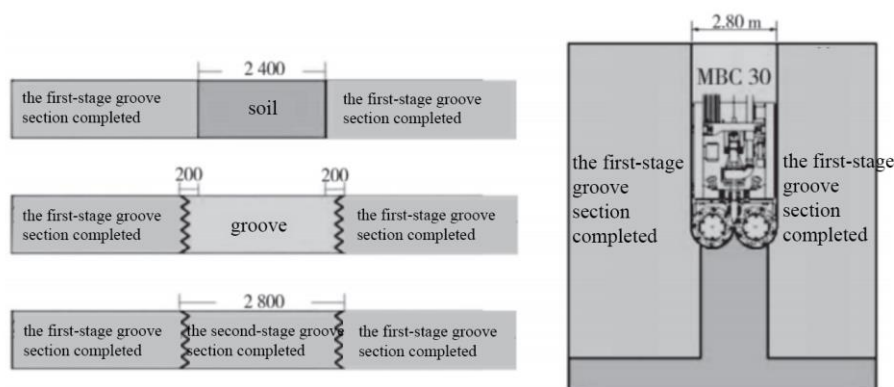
Schematic diagram of milling construction technology for underground diaphragm wall sleeve [14]
